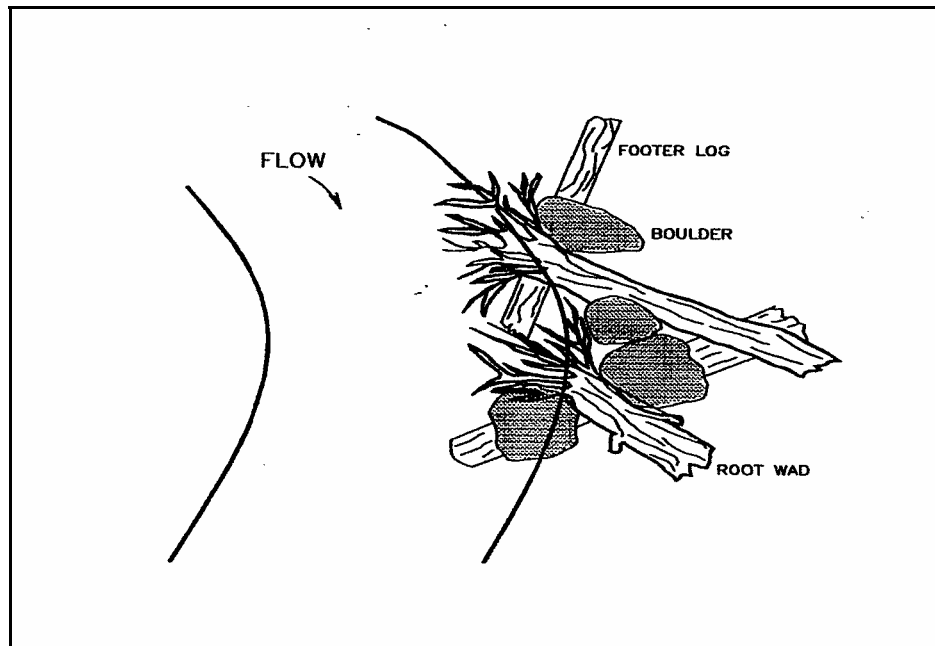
Native material revetment – Plan View. (After Rosgen, 1993)
